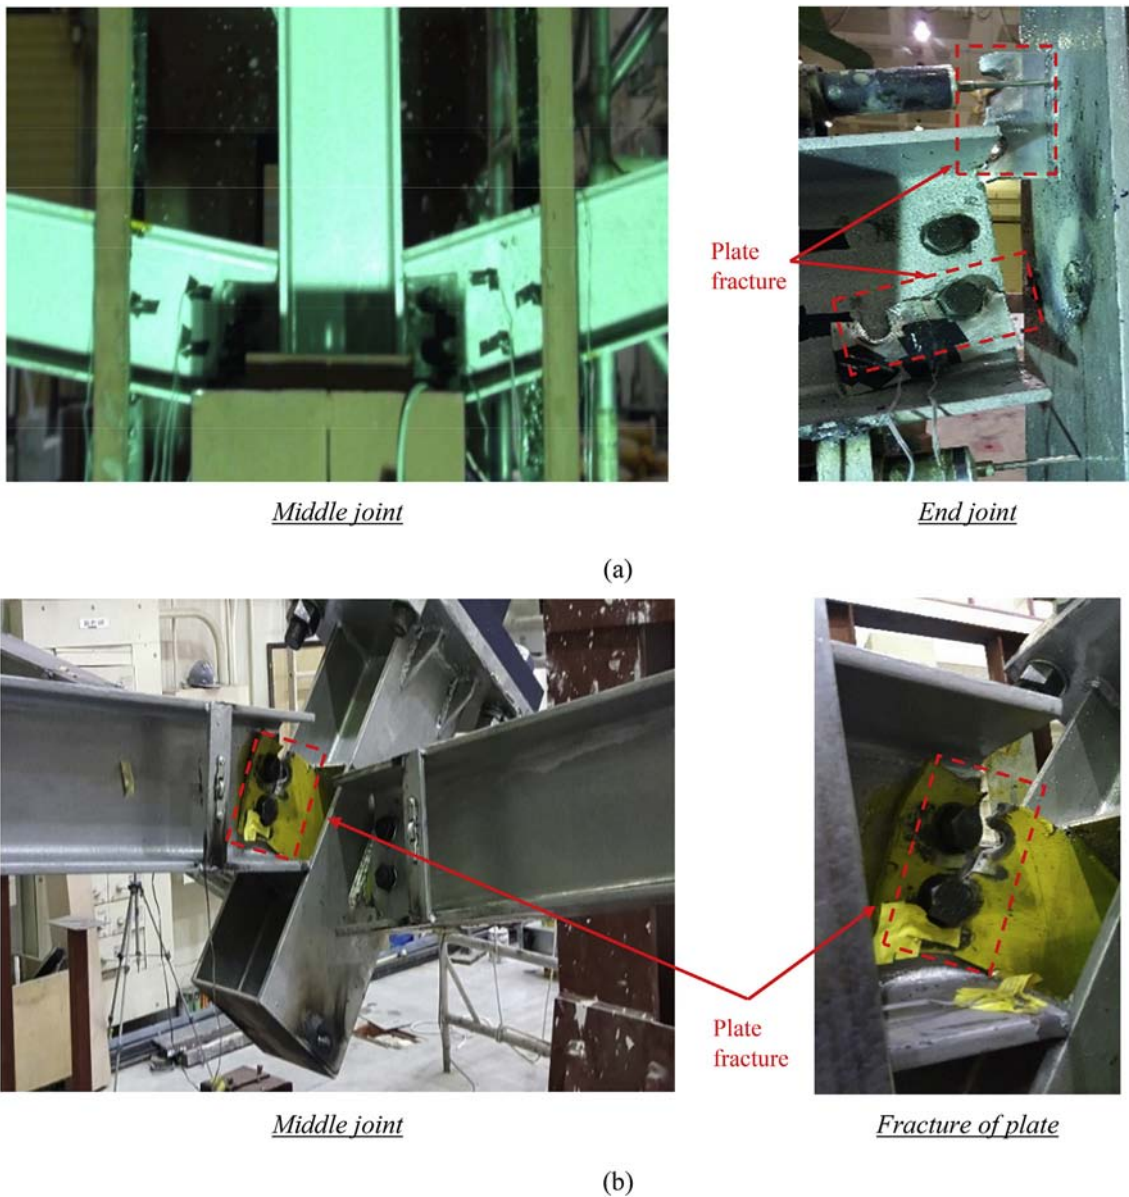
Experimental failure mode for assemblies of this study: (a) Assembly S-P-B-2D; (b) Assembly S-P-B-3D.
